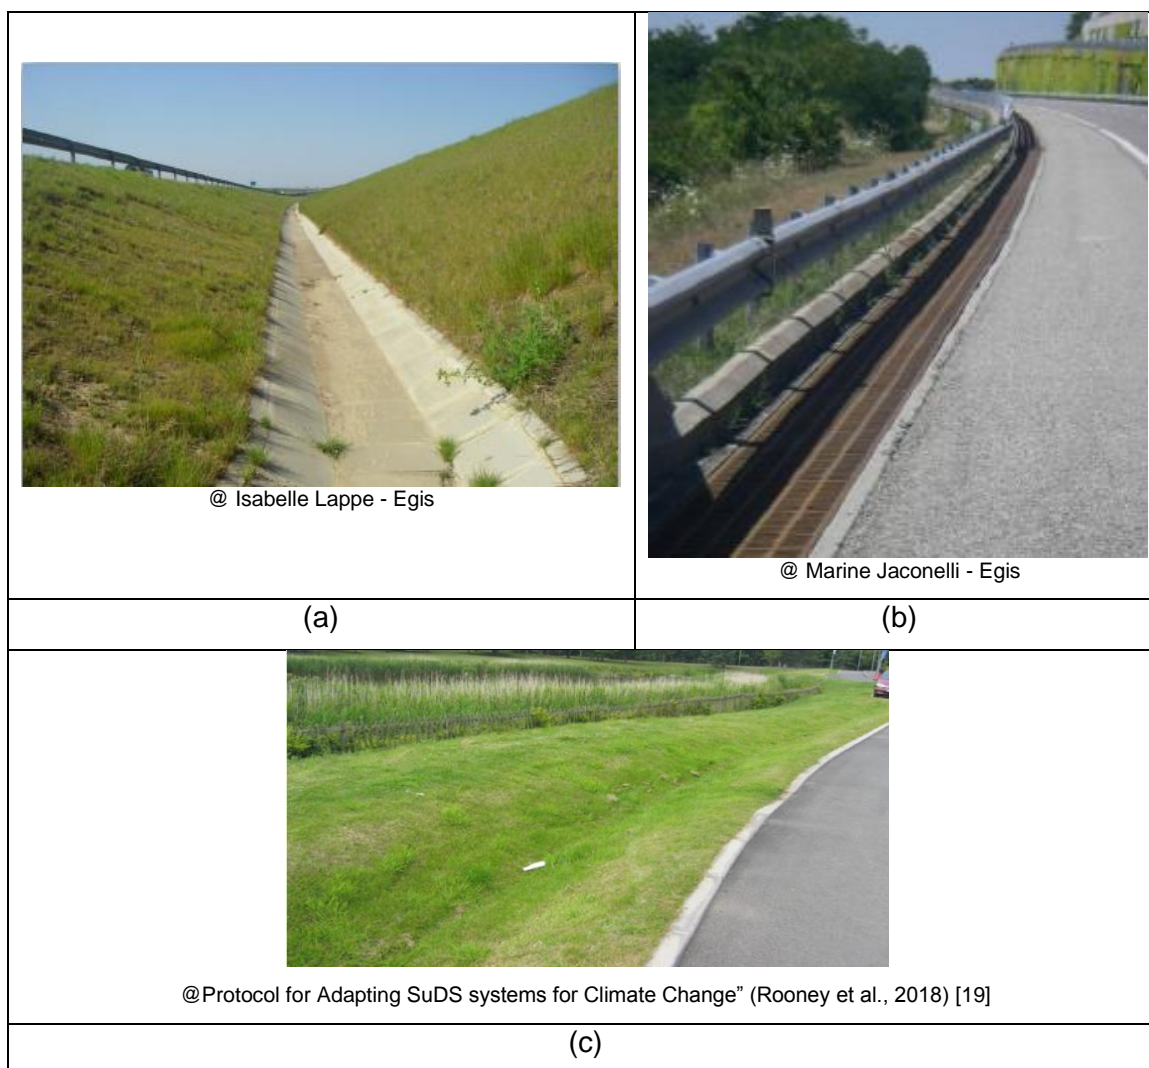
Storm drain system: (a) Concrete channel, (b) Rectangular concrete grating channel (c) swale
